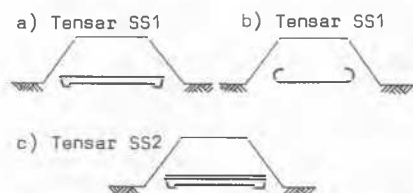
Design variations: a) roundabout chainage 2100 b) Industrial access road c) Embankments over 3m high
